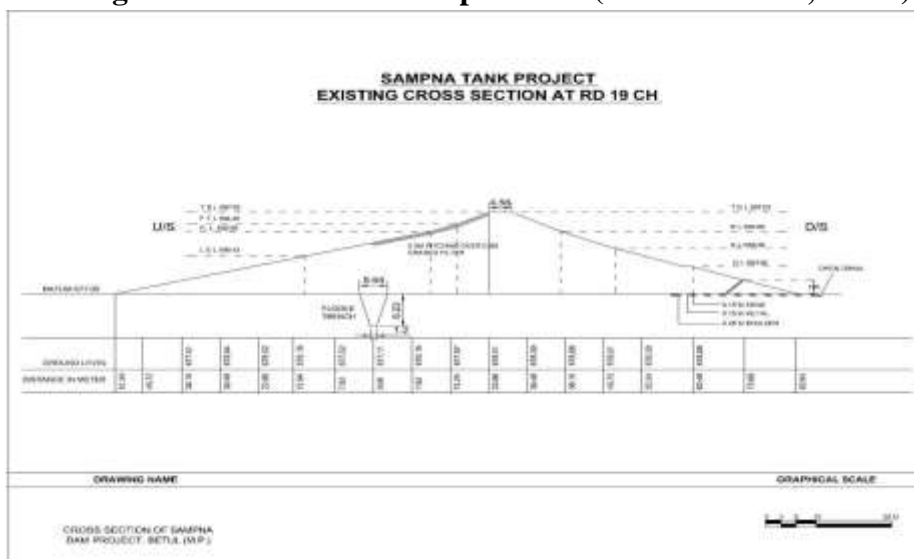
Existing Cross Section at RD 19 CH (Source: NRLD, CWC)
